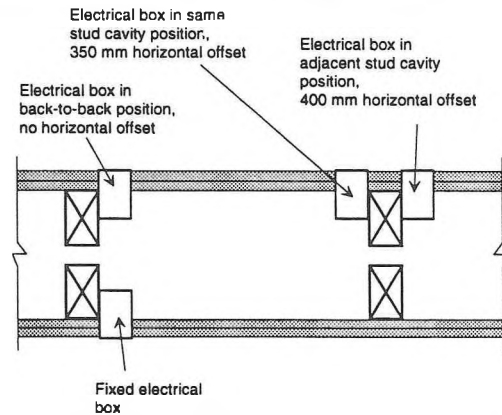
(a): Positions of the electrical boxes in the double stud wall having double wood studs 400 mm o.c., separate head and sole plates separated by 25 mm, two layers 12.7 mm regular gypsum board on either side.
